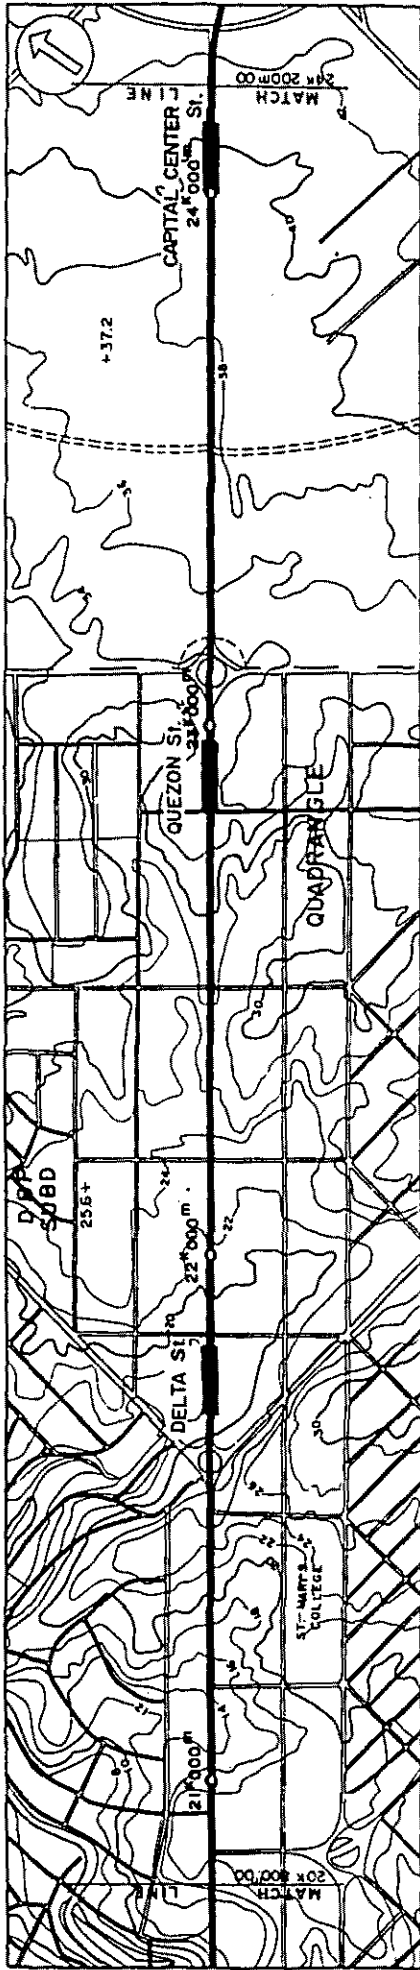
Plan and Profile for All Underground Alternative (1)
